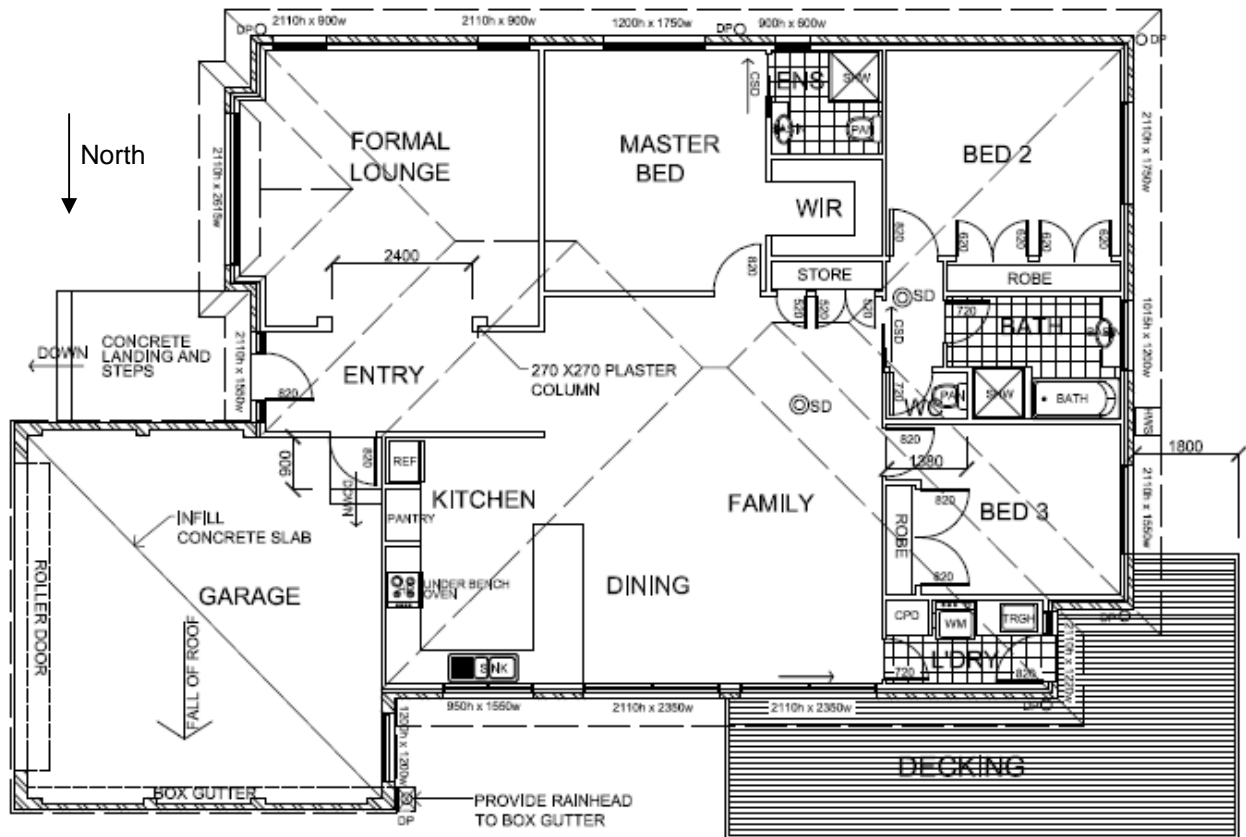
Floor plan of house considered (decking and landings excluded from calculations).
